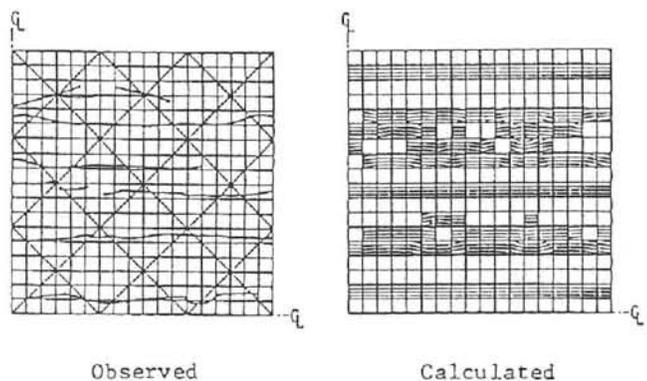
Crack Pattern of Reinforced Concrete Panel [2-27]
